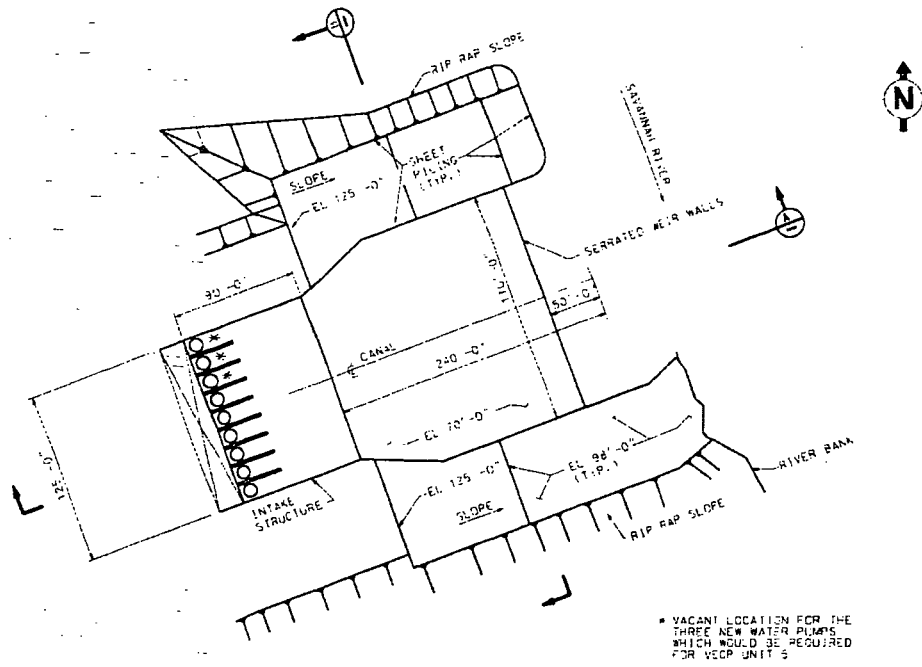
Plan View of River Intake System (Southern 2007a)
